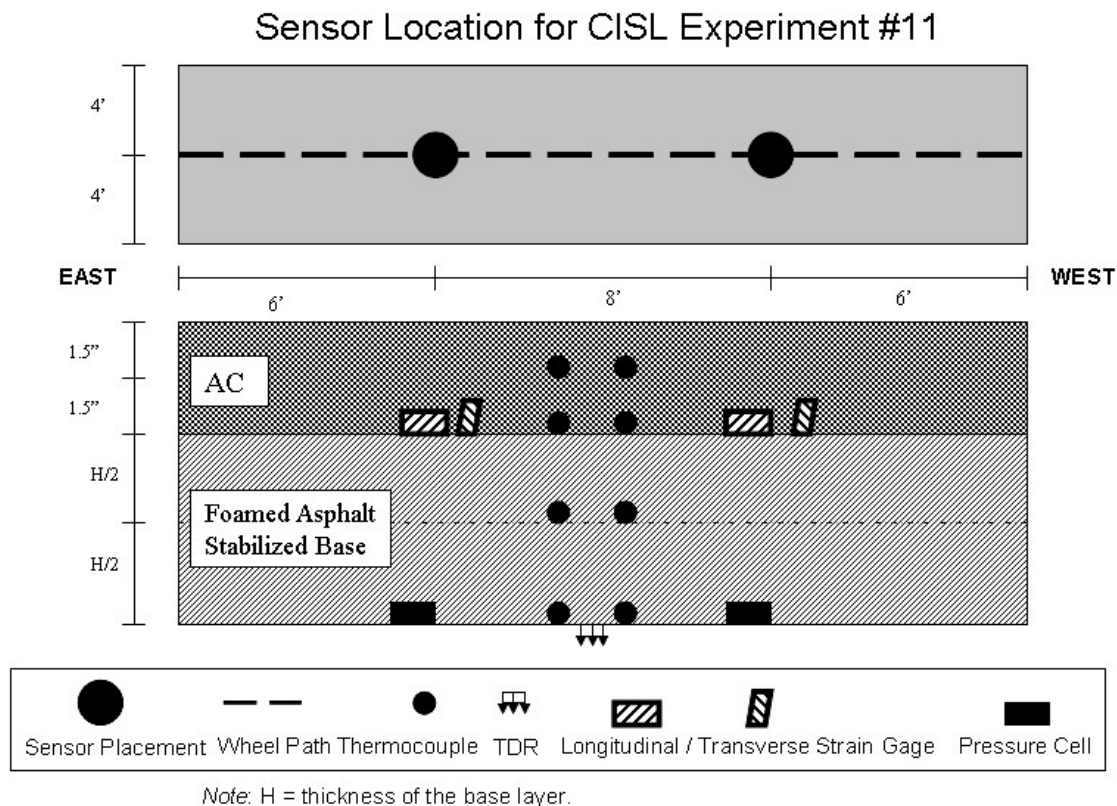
Location of Sensors Embedded in the Pavement Structure
